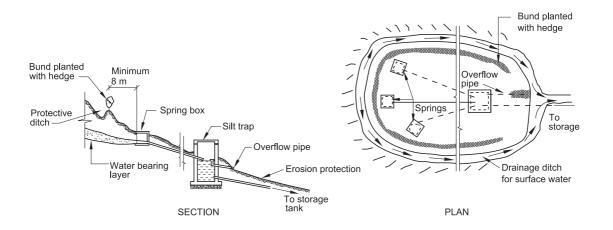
Layout of spring protection works for multiple spring eyes (Cairnross and Feachem 1978)
